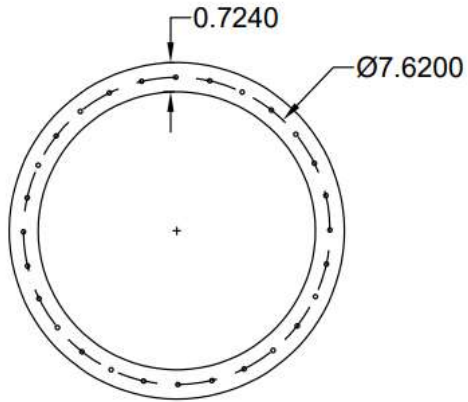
200 m cross section at 100 m, 28 ducts.
